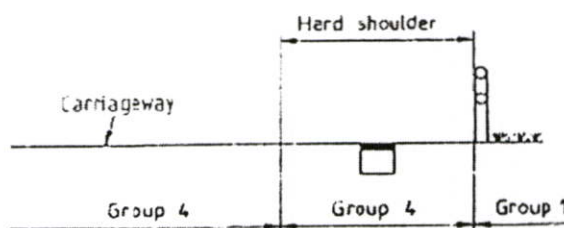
Typical detail of a hard shoulder showing the location of some installation groups
